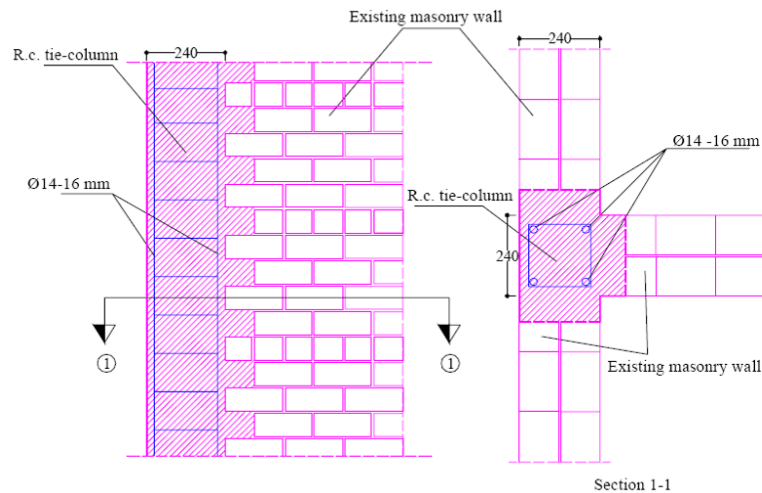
Placement of New Tie-Columns in a Brick Masonry Wall (Badoux et al., 2004)
